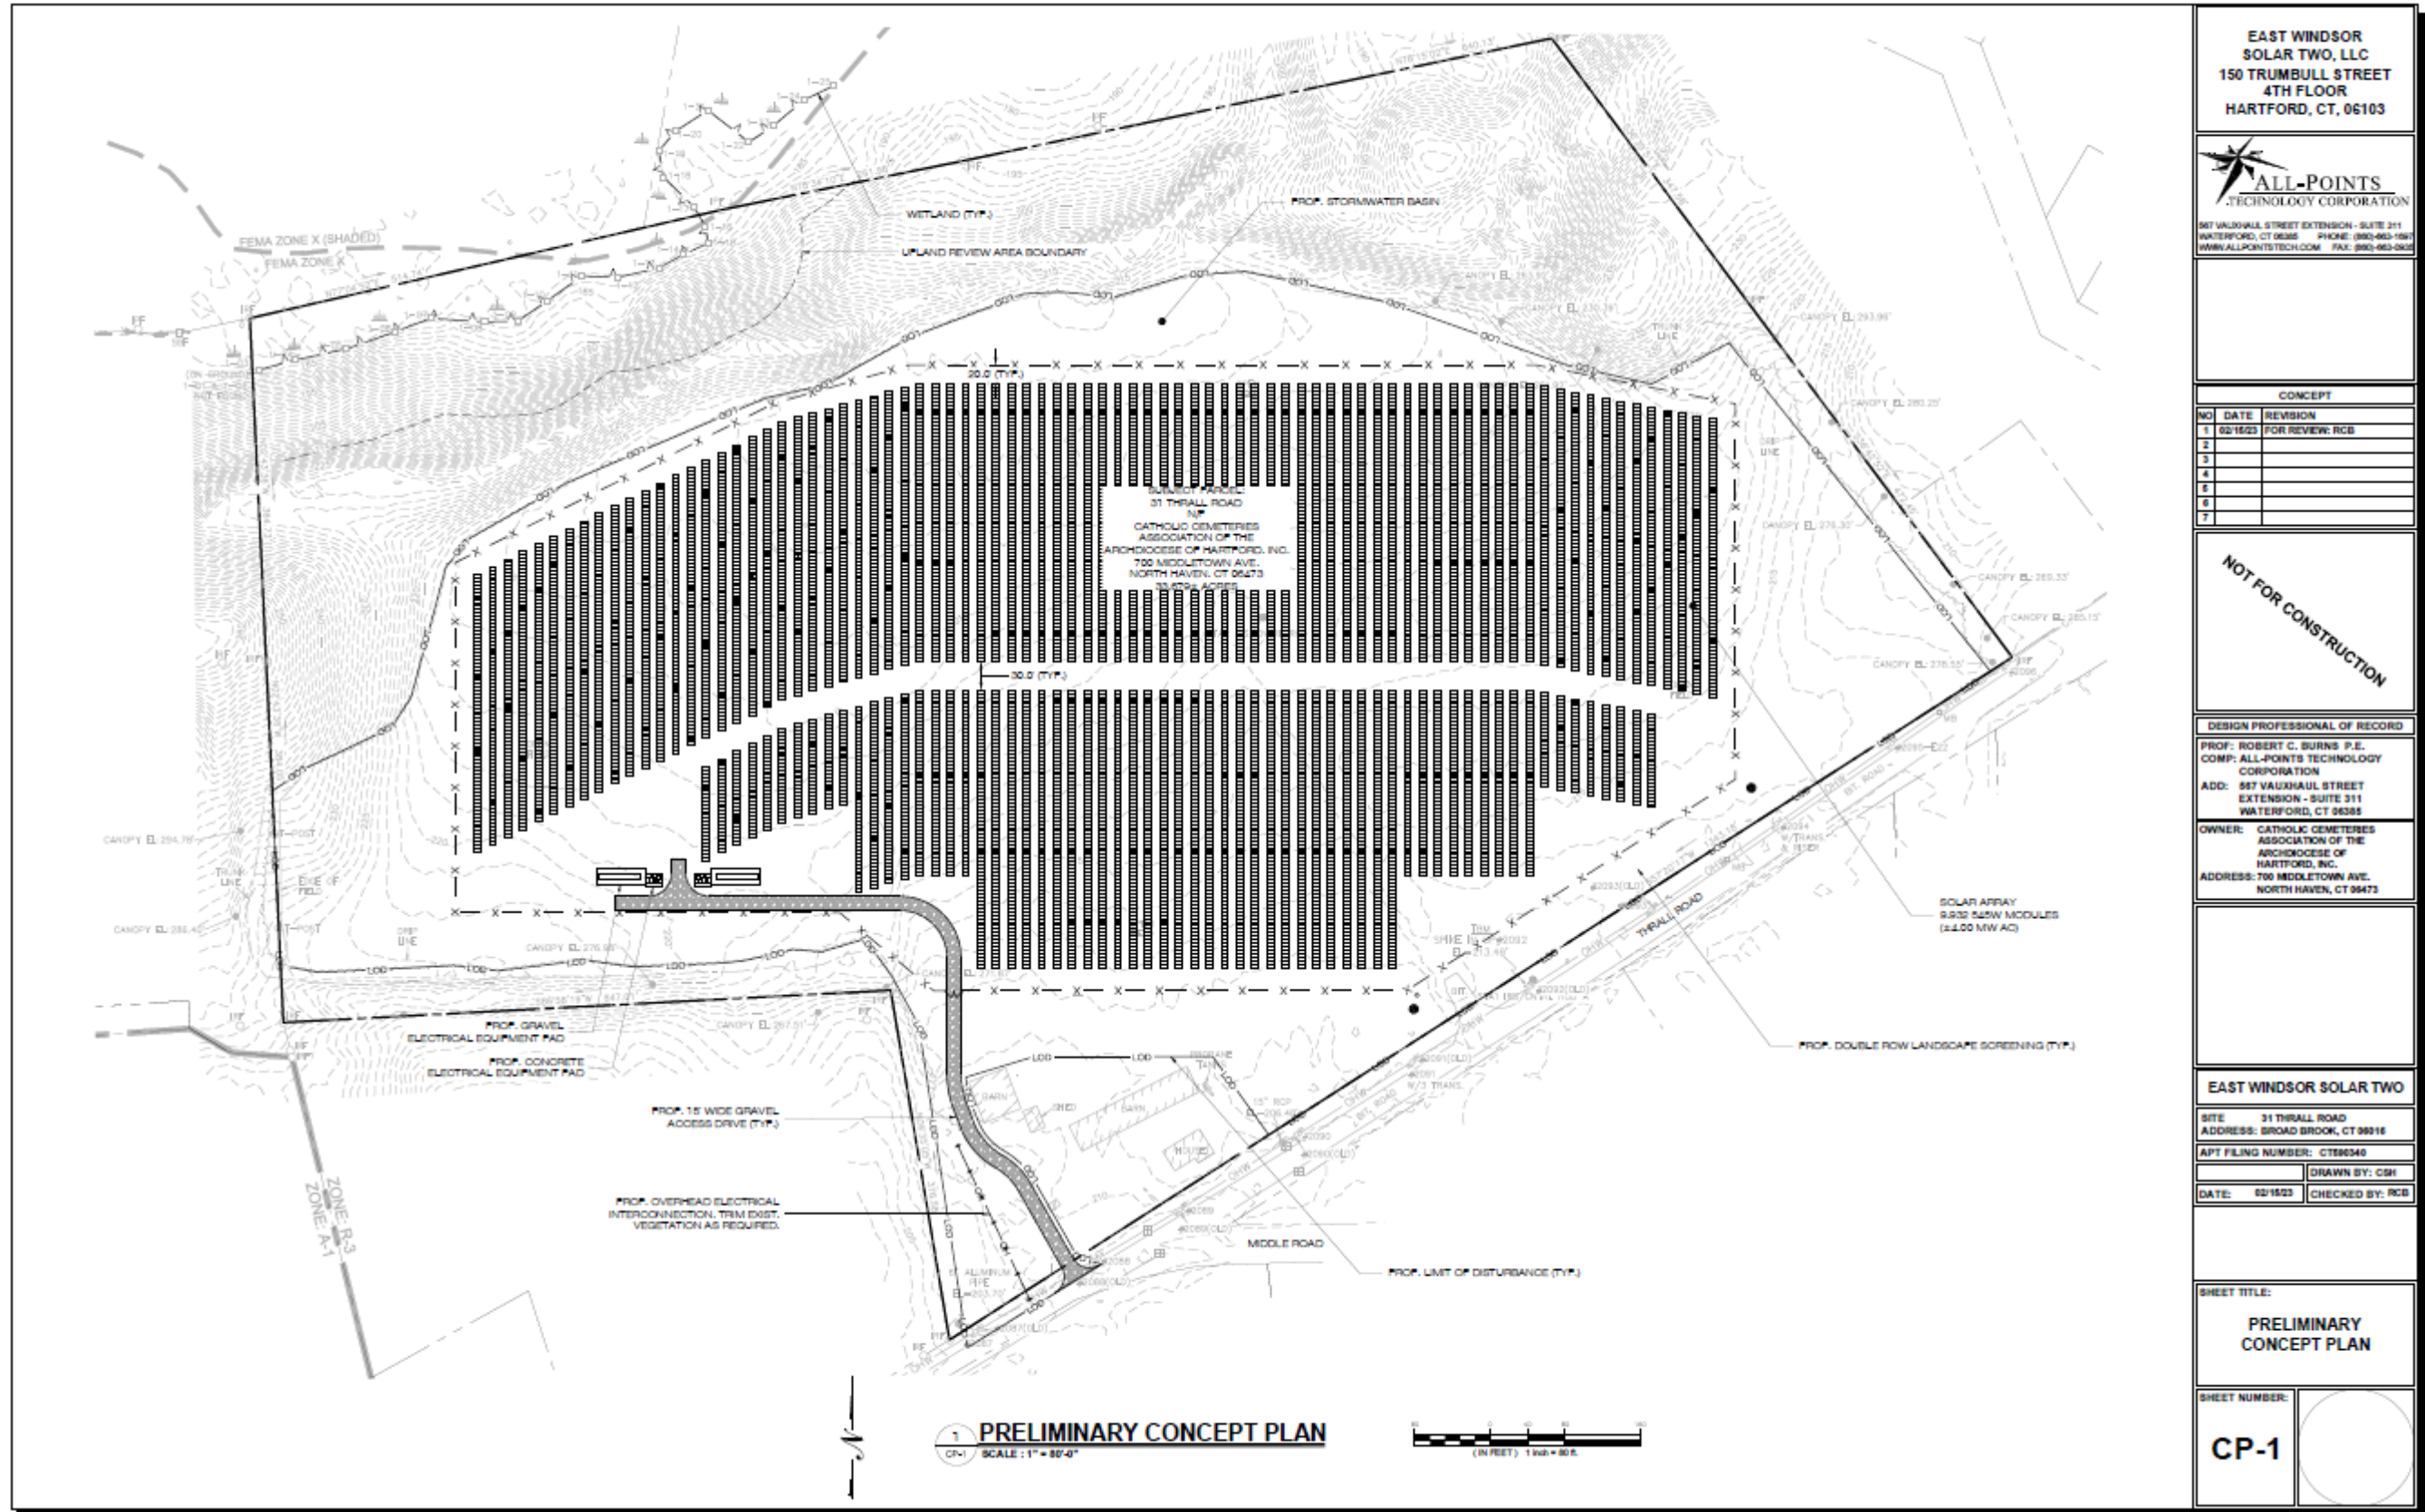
Project plans showing the proposed solar facility in East Windsor, Connecticut.
